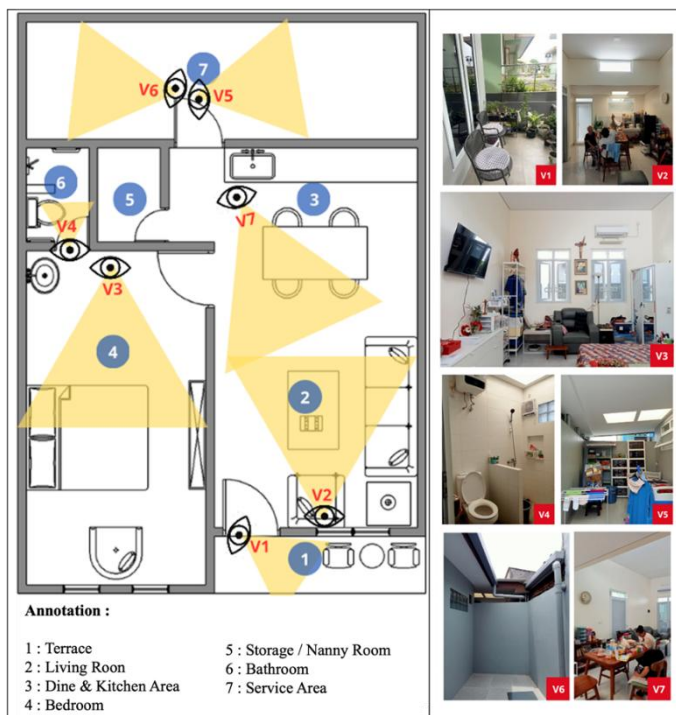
Layout-Plan and Existing Condition of Pavilion Unit
